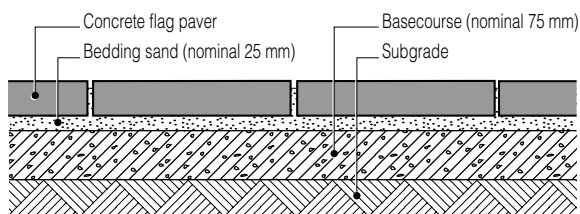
Typical Cross Section – Pedestrian-only Pavement
